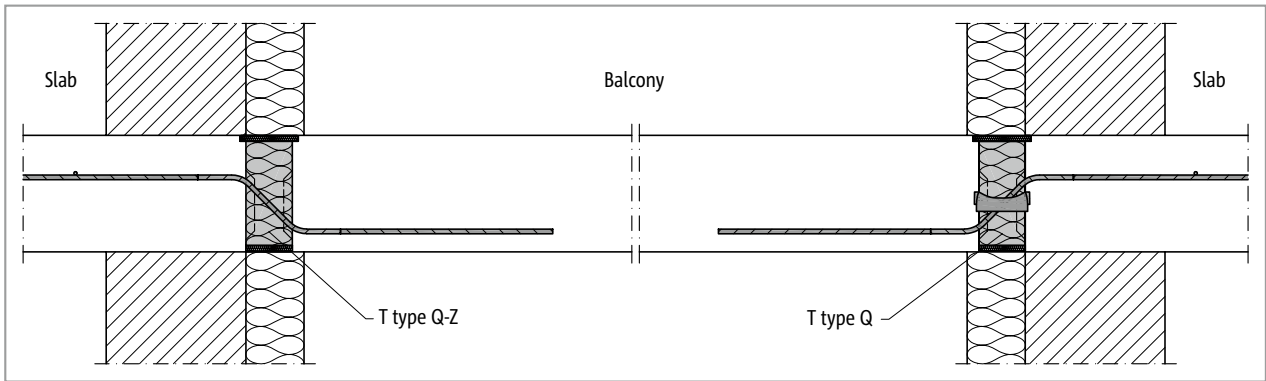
Schöck Isokorb® T type Q-Z, Q: Application case one-way reinforced concrete slab
